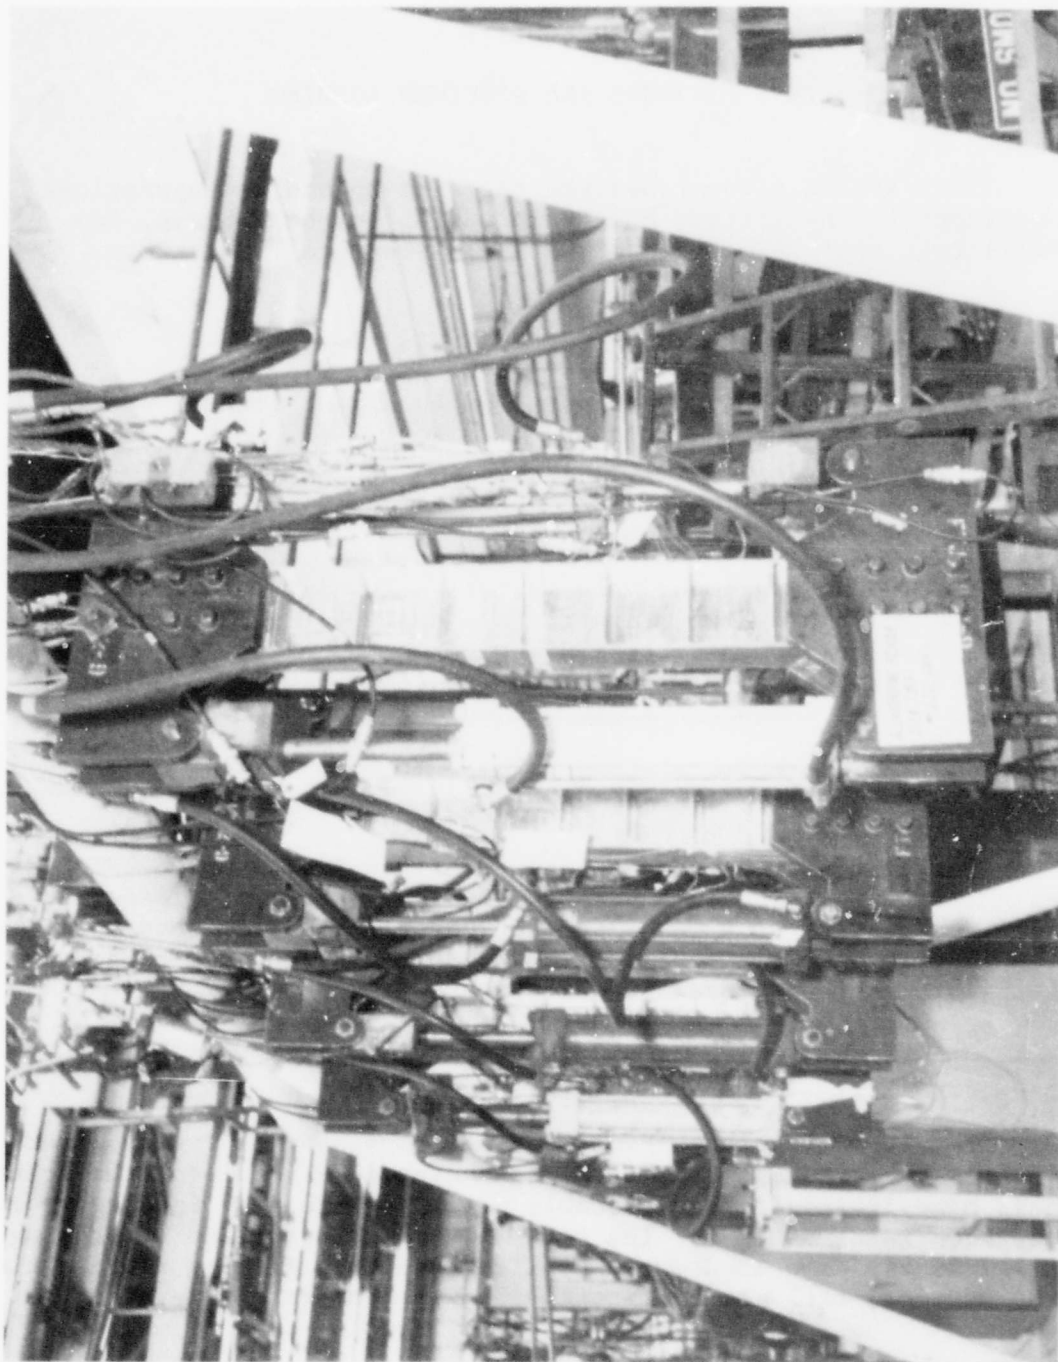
I-BEAM TEST LOADING ARRANGEMENT
